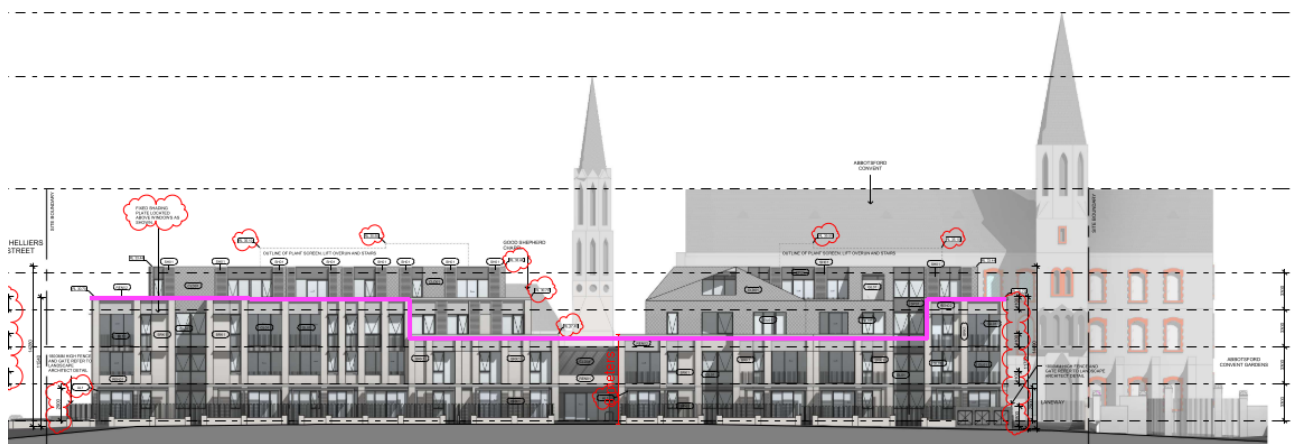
Planning officer mark-up of west elevation showing variation in street wall height in pink
